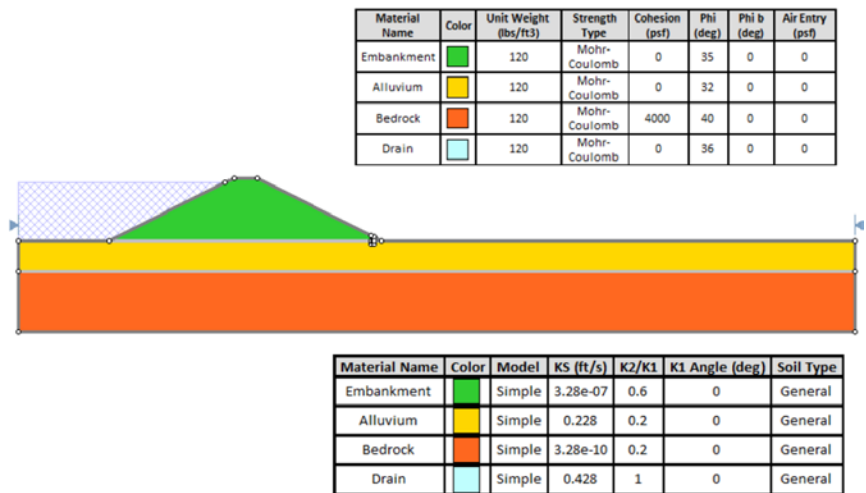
Finite element seepage and slope stability model for Hallenbeck Dam in Colorado.
